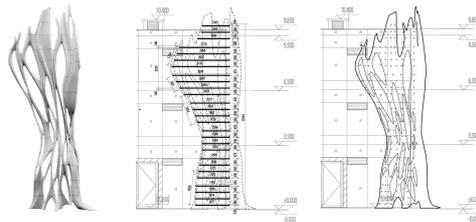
Freeform design (left); Structure strategy (middle); Tie rods (right) (modified from façade structural drawings © ASW).
